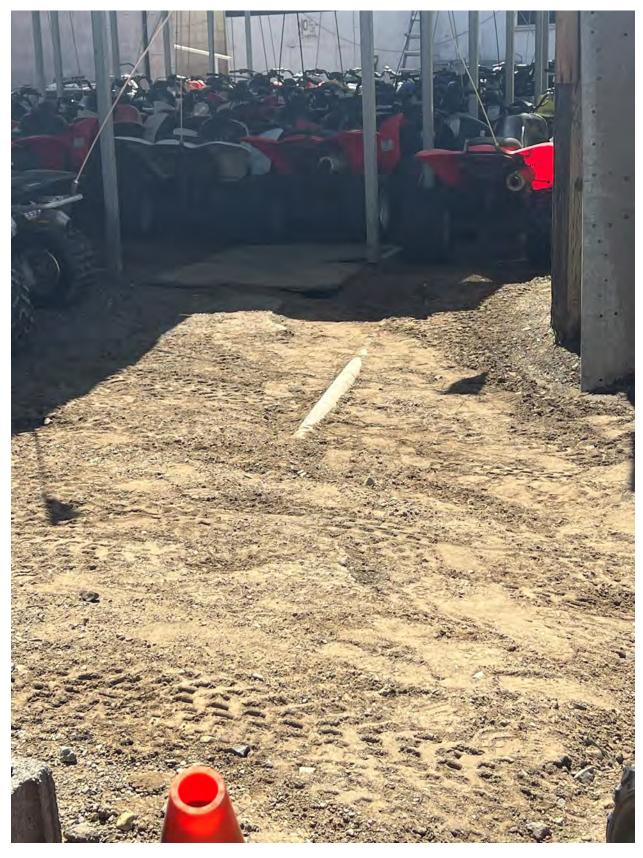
Drainpipe from photo 15 observed traversing under covered ATV storage
